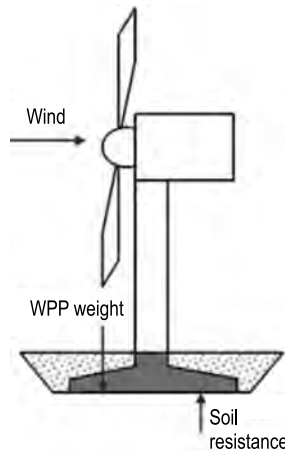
Inverted 'T' Soil weight and concrete balances the foundation to prevent tipping over.
